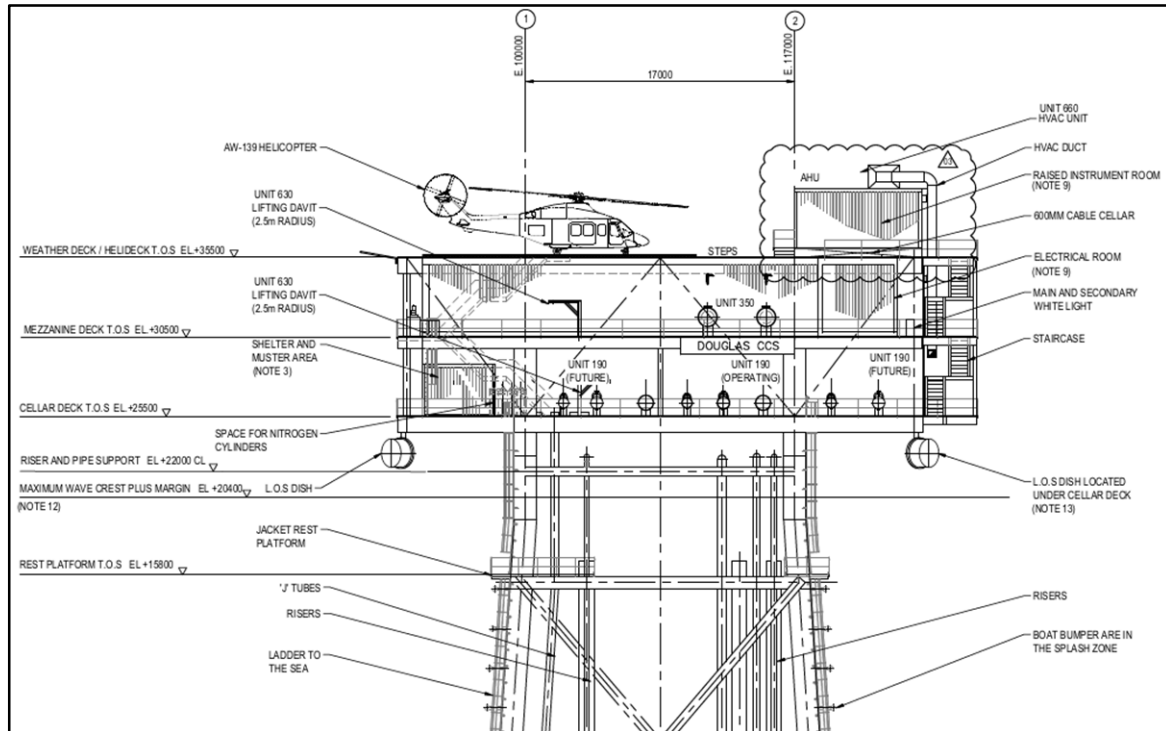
New Douglas Topside on New Jacket (Elevation Looking North)
